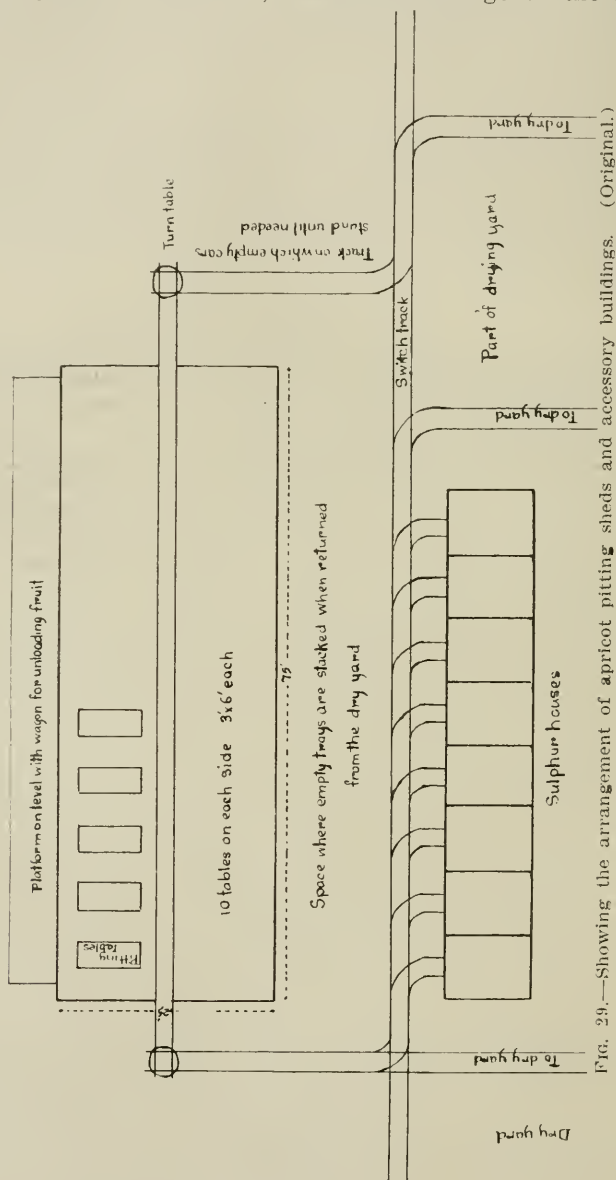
Showing the arrangement of apricot pitting sheds and accessory buildings. (Original.)
